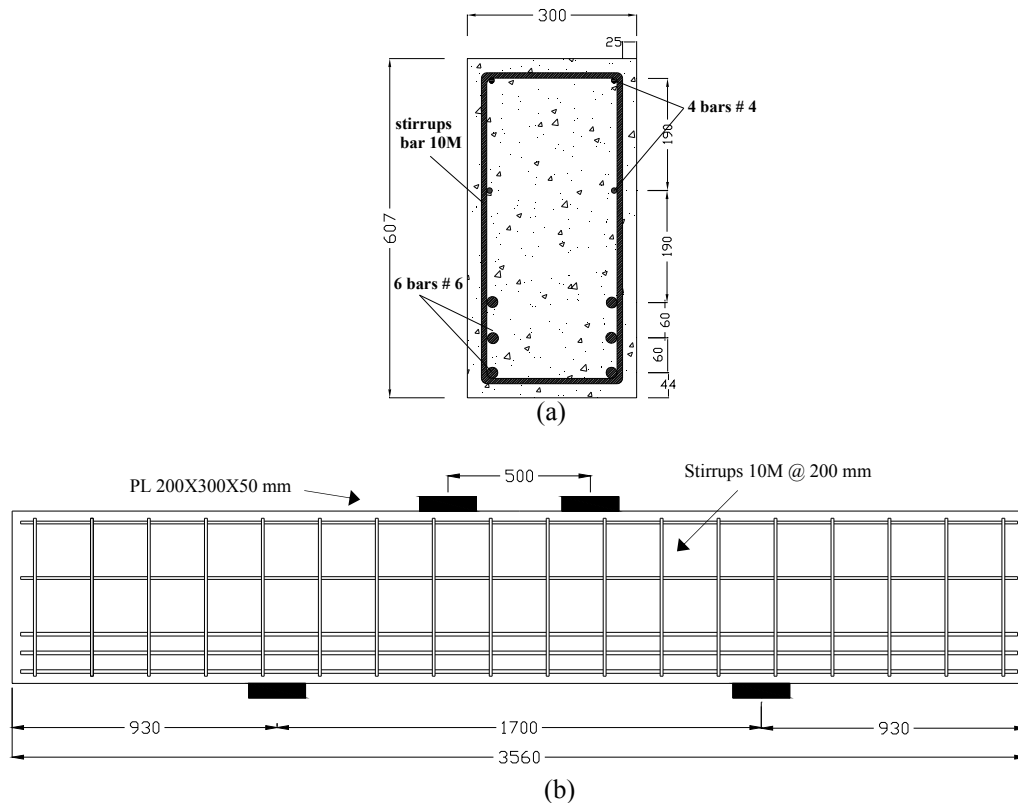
Beam MS1-2: (a) Cross section (b) Elevation.
